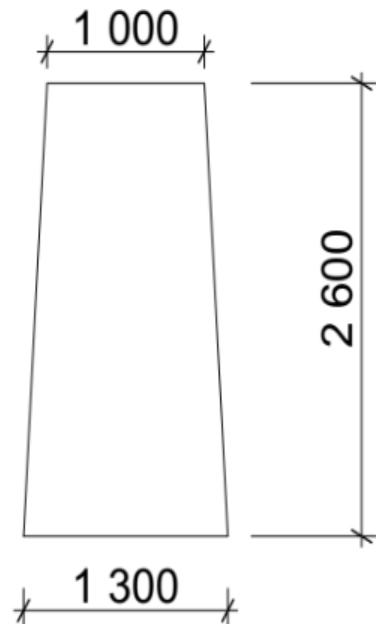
Basic drawing of a snow wall structure (Riikonen 2009)
